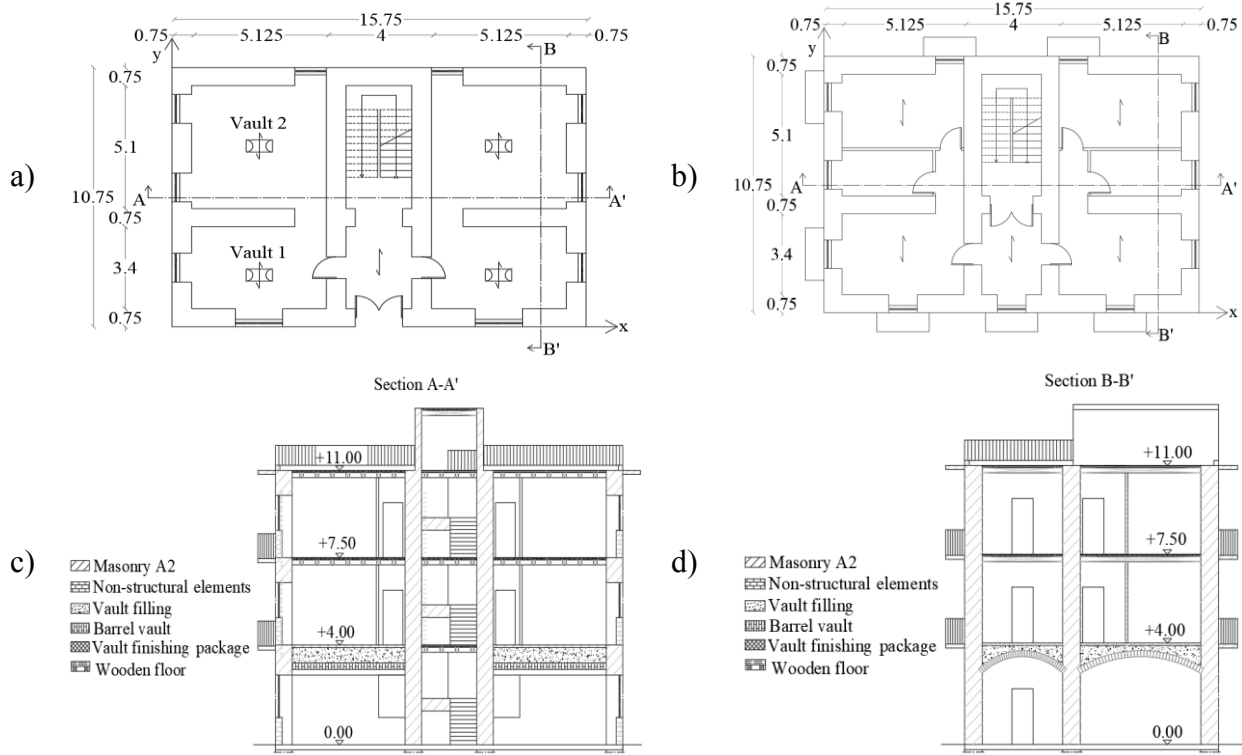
Archetype building: (a) ground floor plan; (b) typical floor plan; (c) section AA'; (d) section BB'.
